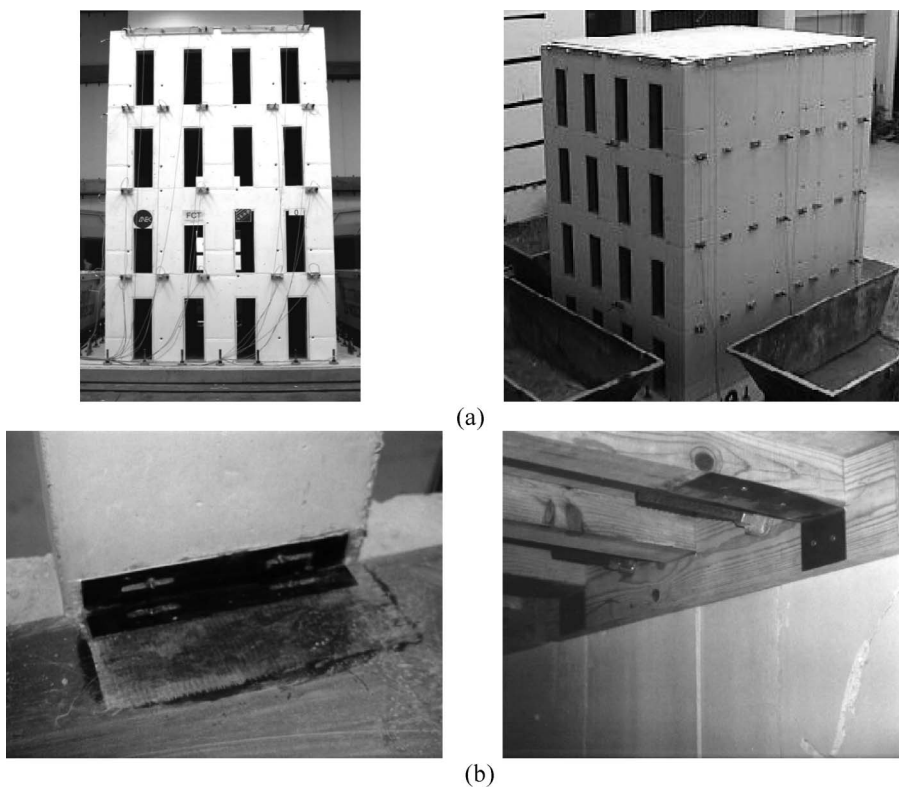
Experimental models: (a) Model 0; (b) details of the Model 1 wall-to-floor connection.
